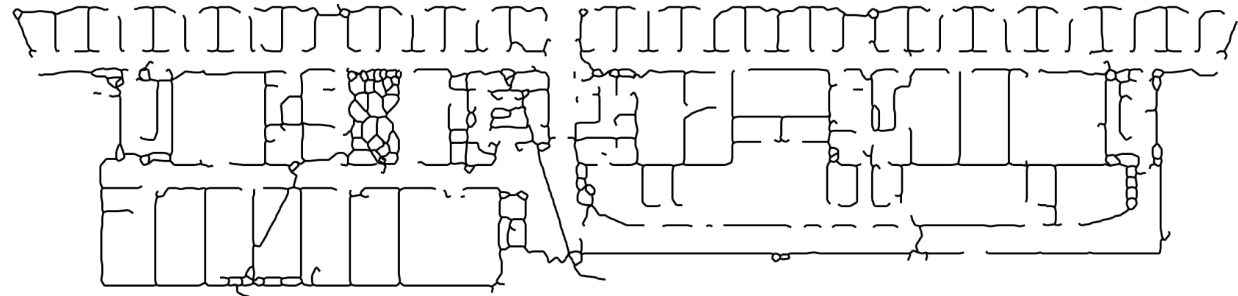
UCSC Engineering 2 Floor 2 floor plan image
